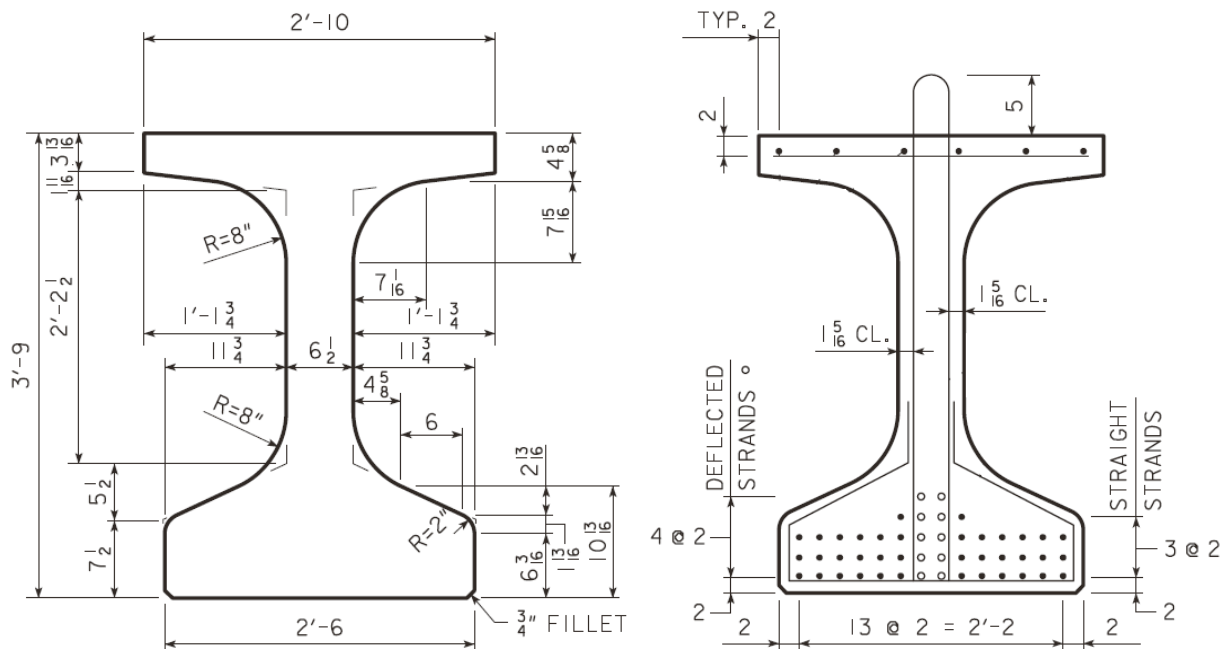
BTC115 cross-section (left) and midspan reinforcement layout (right)
